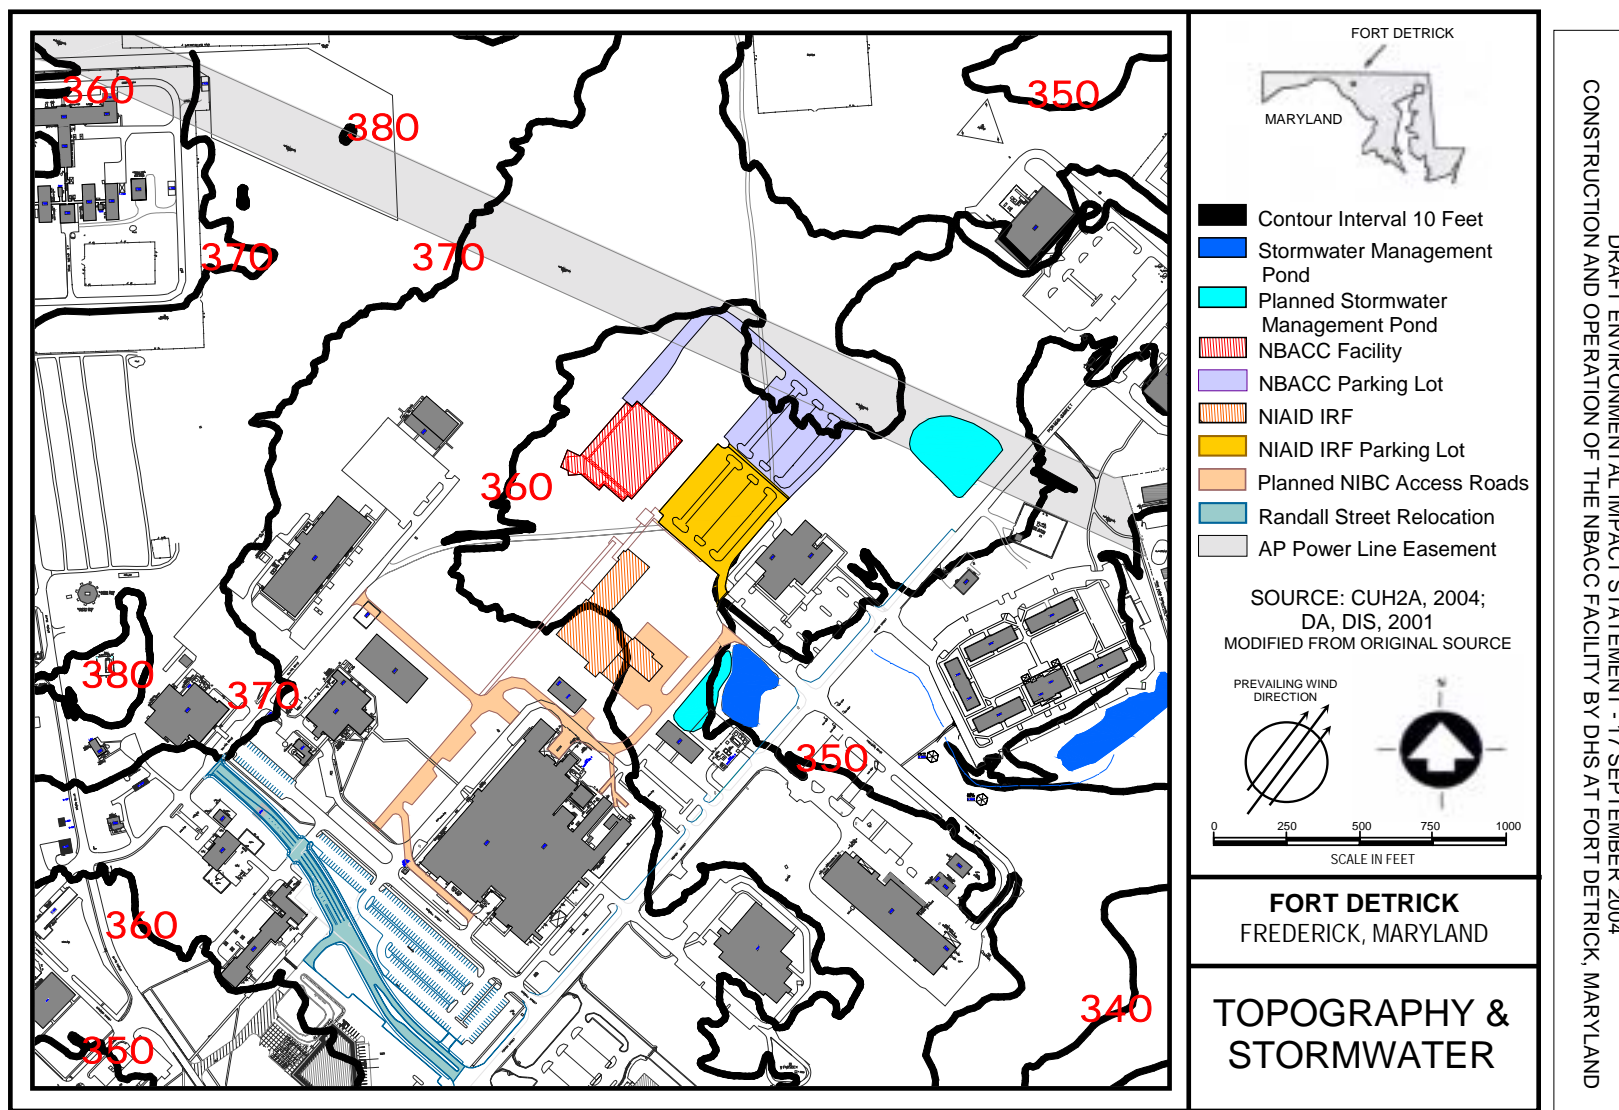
Topography and Stormwater Management Ponds for the Proposed NBACC Facility Site.
